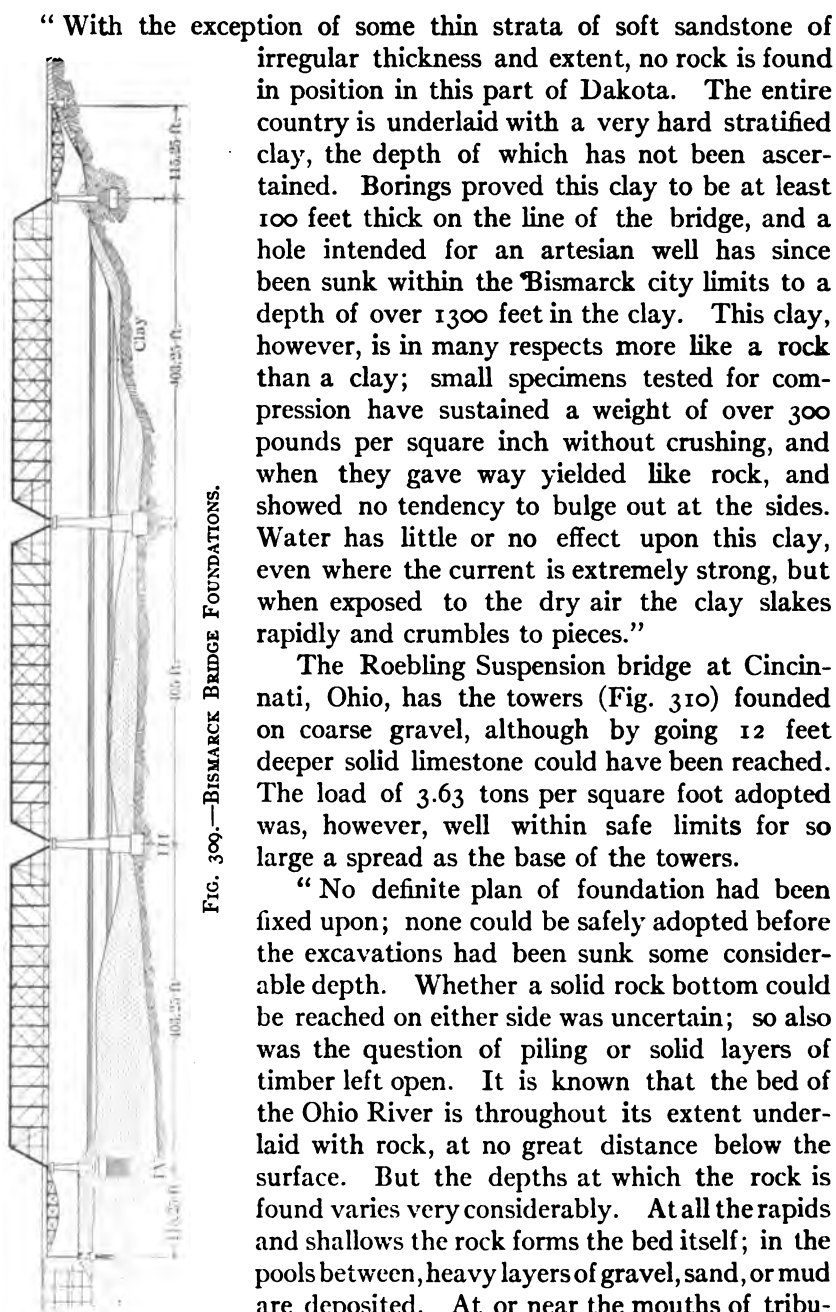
BISMARCK BRIDGE FOUNDATIONS.
